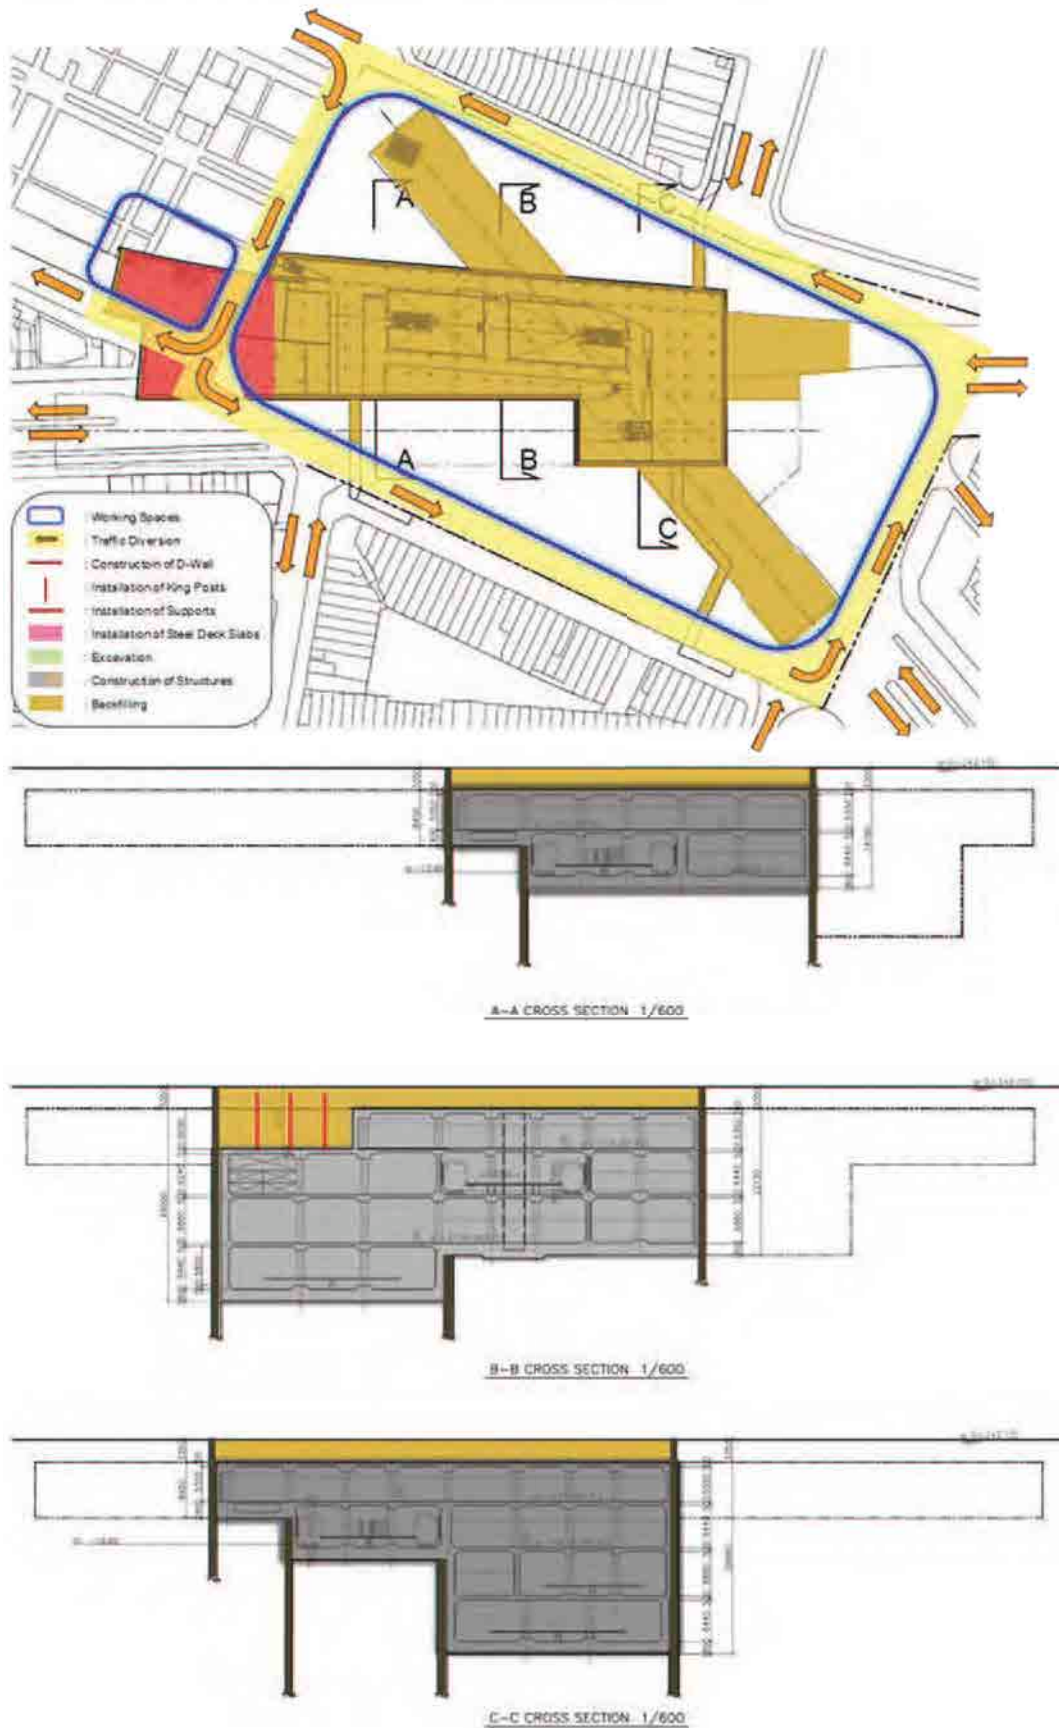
Construction Sequences of Ben Thanh Central Station (7/24)
